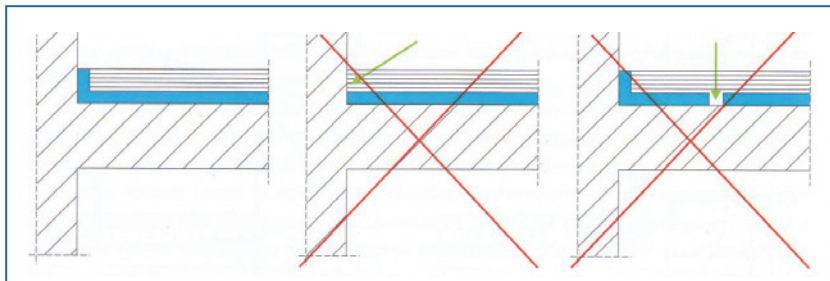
Examples of floor construction. a) Floor made with no error; b) Flooring with rigid connection to the wall; c) Acoustical bridge between flooring screed and supporting floor.
